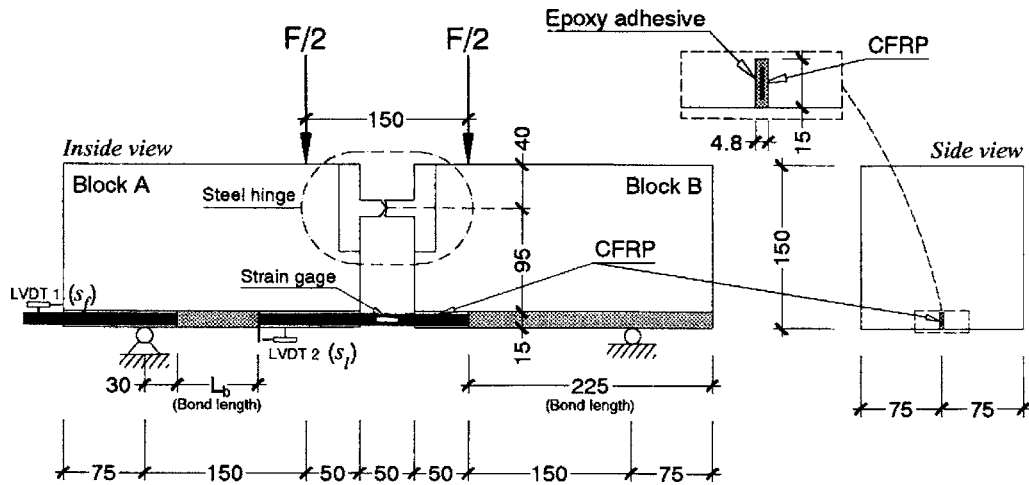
Specimen geometry and test configuration (all dimensions in millimeters)
